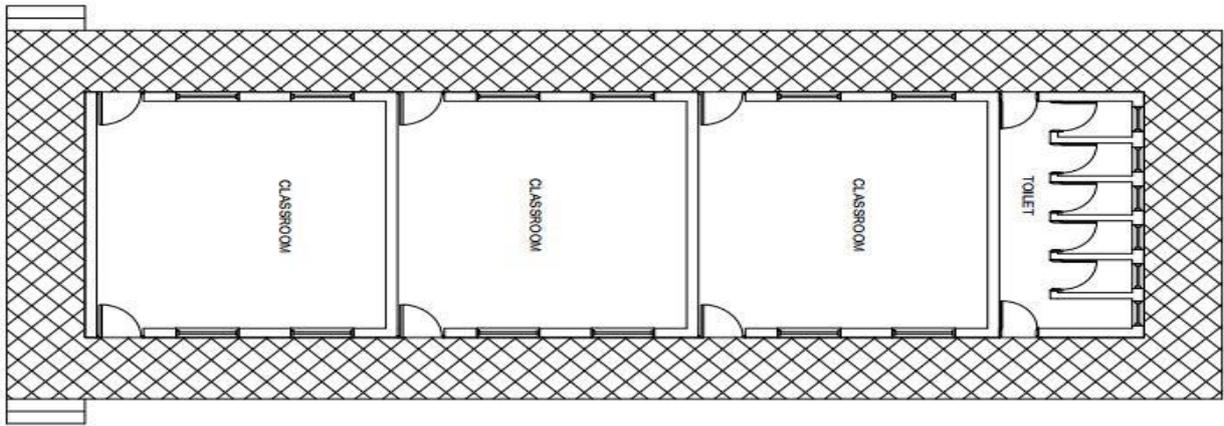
Classroom Plan Layout Showing Galleries on Both Sides
